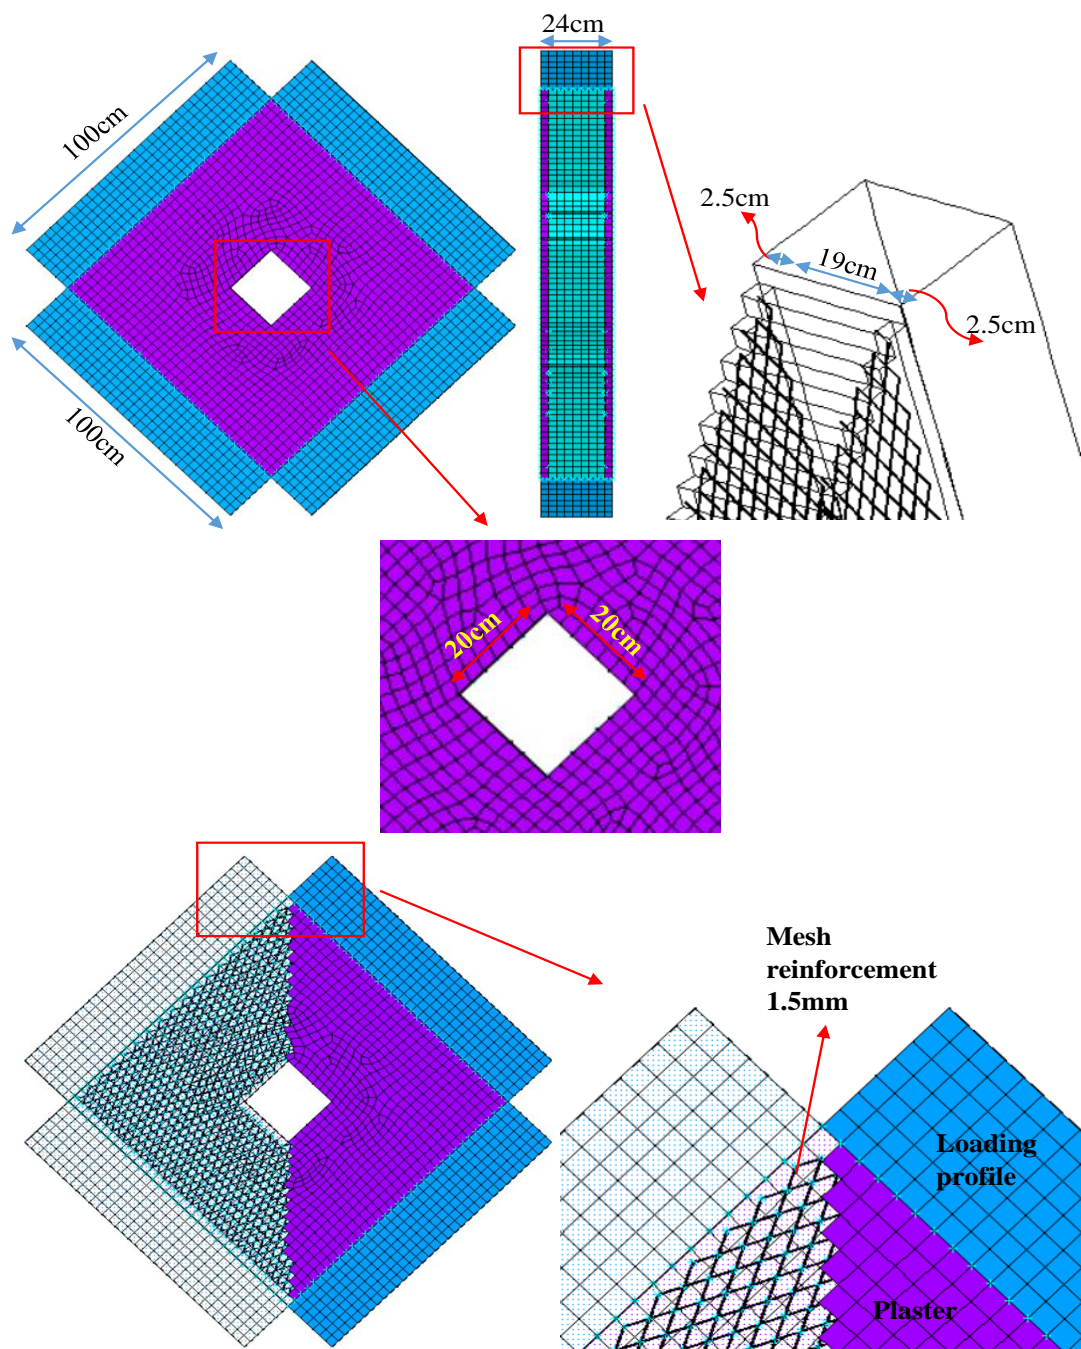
20% opening ratio of the masonry wall model-1.5mm mesh reinforcement
